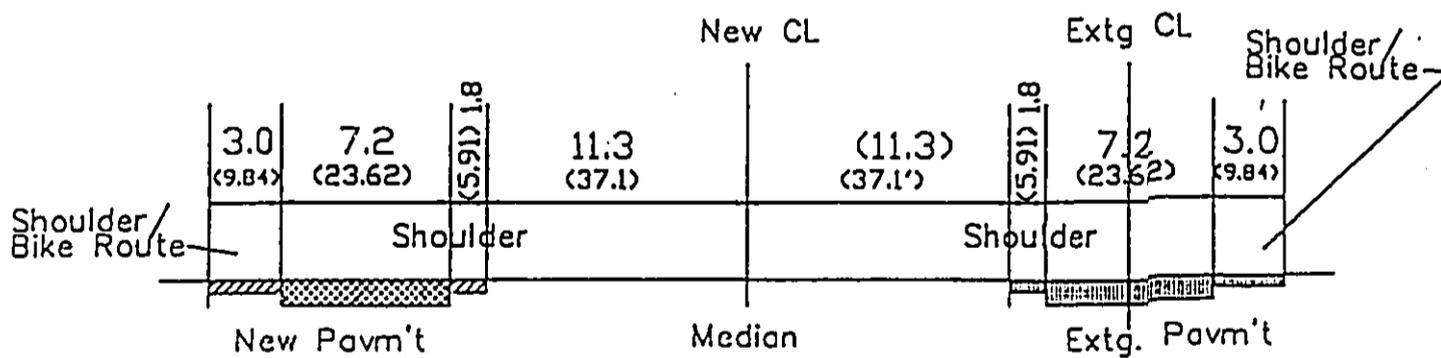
TYPICAL 4 LANE ROAD SECTION
